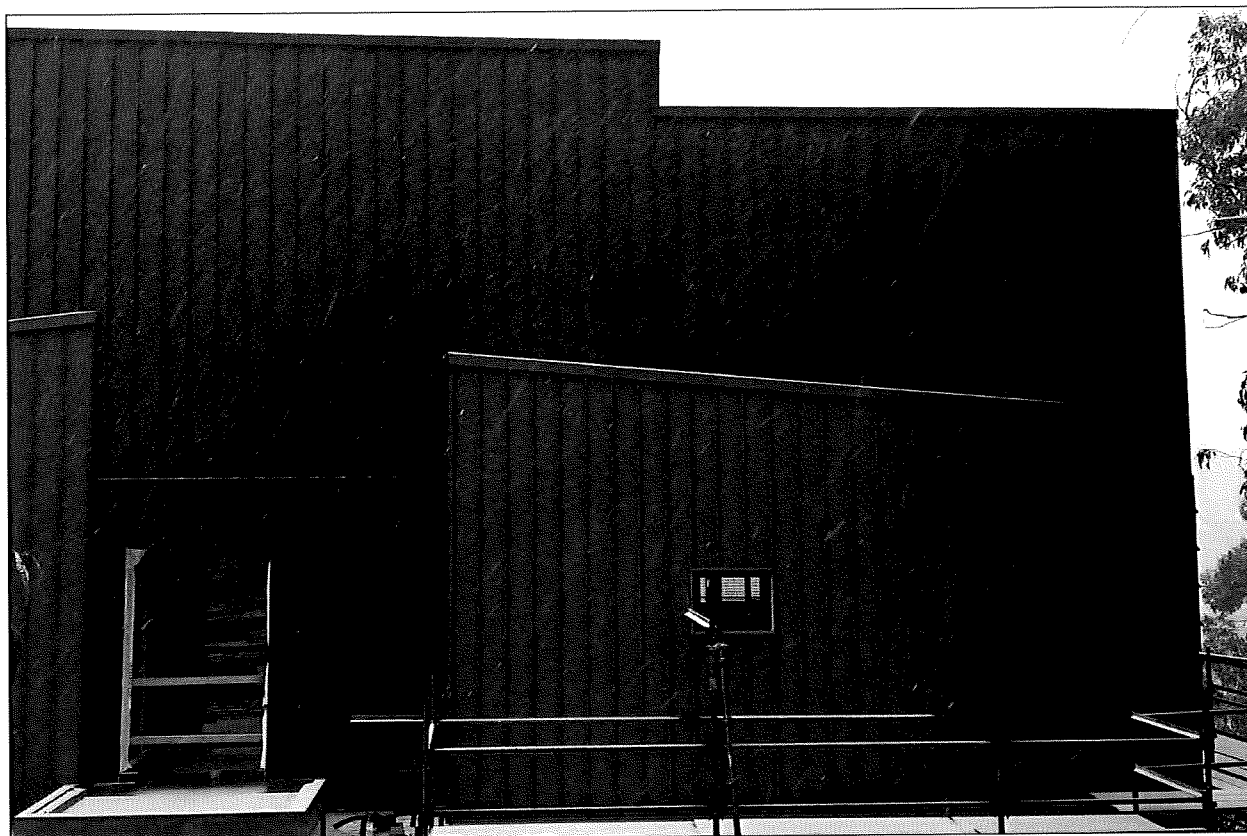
Example photograph of proposed cladding for the roof and walls to Level 5 (Source: Department)
